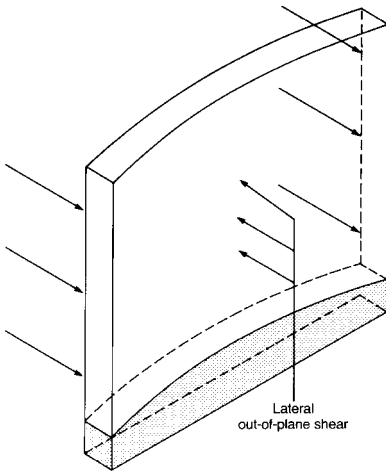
Shear failure on dpc line of laterally loaded wall.
